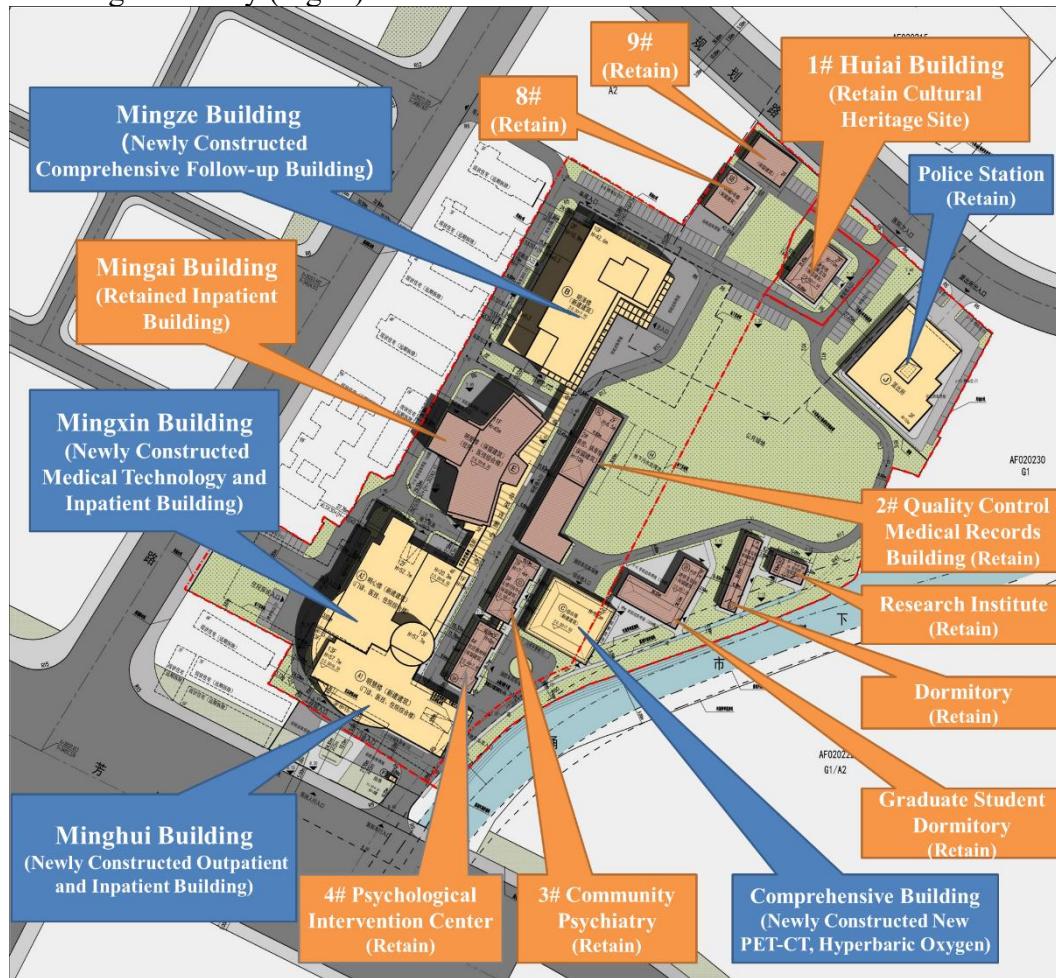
Overall layout plan of Huiai Hospital in Guangzhou
